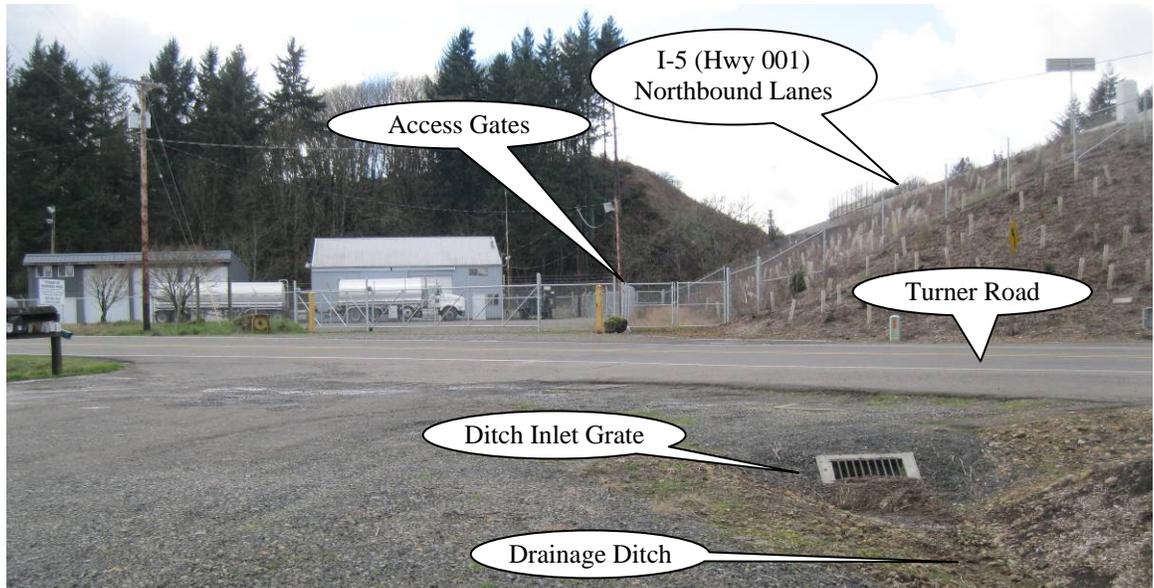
Access to outfall pipe to ditch. Photograph taken facing southwest. Refer to the Operational Plan in Appendix A for the location.
